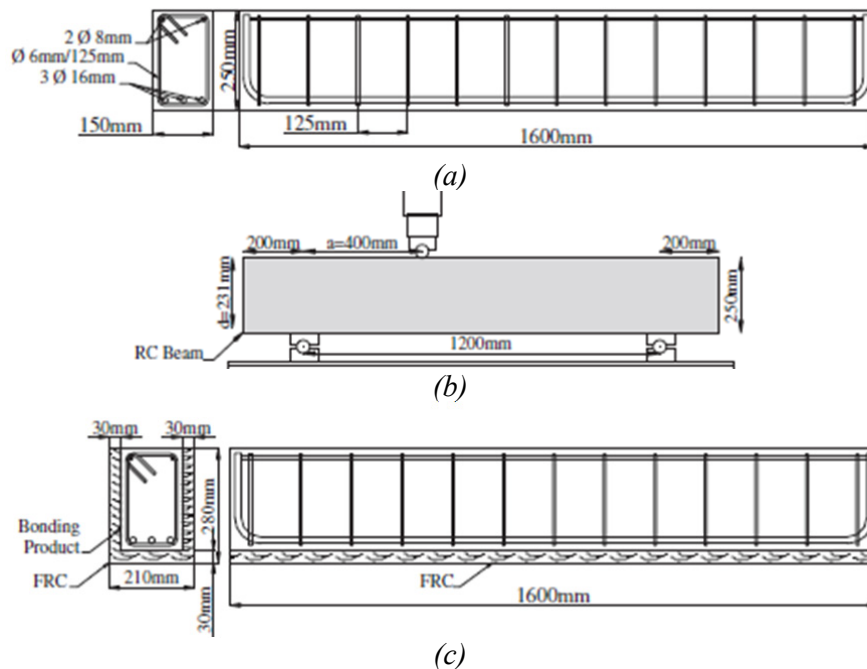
(a) one example of RC beams, (b) test setup, and (c) repair/strengthening scheme (dimensions in mm) (Ruano et al. 2014)
